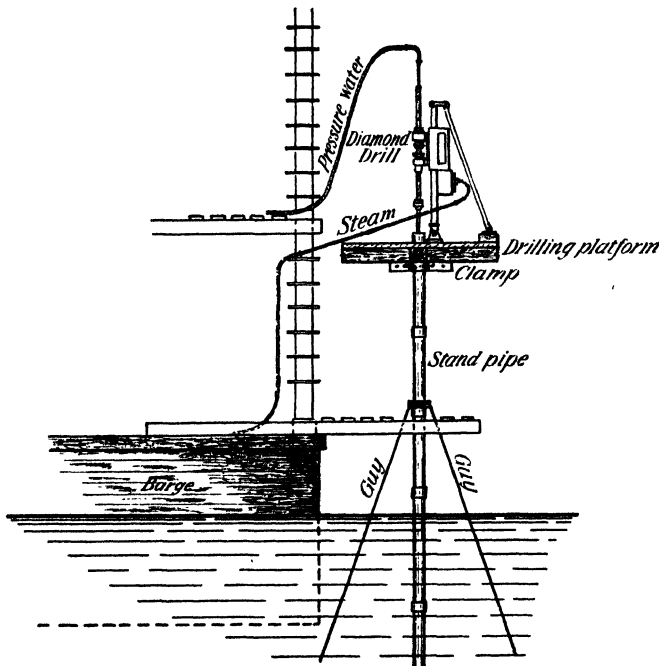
Diamond Drilling Platform on Stand Pipe.
